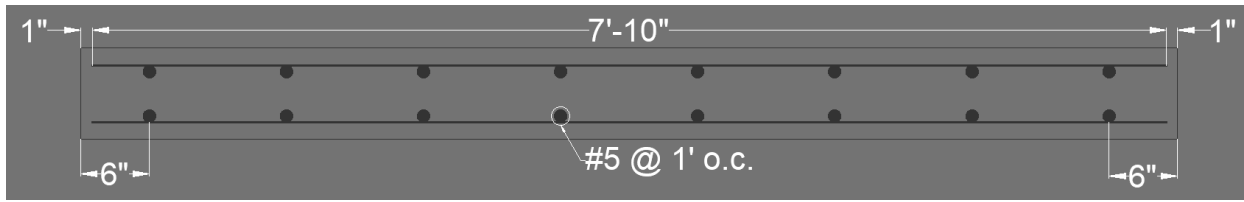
A-A' elevation of specimen design from Figure 3-3
